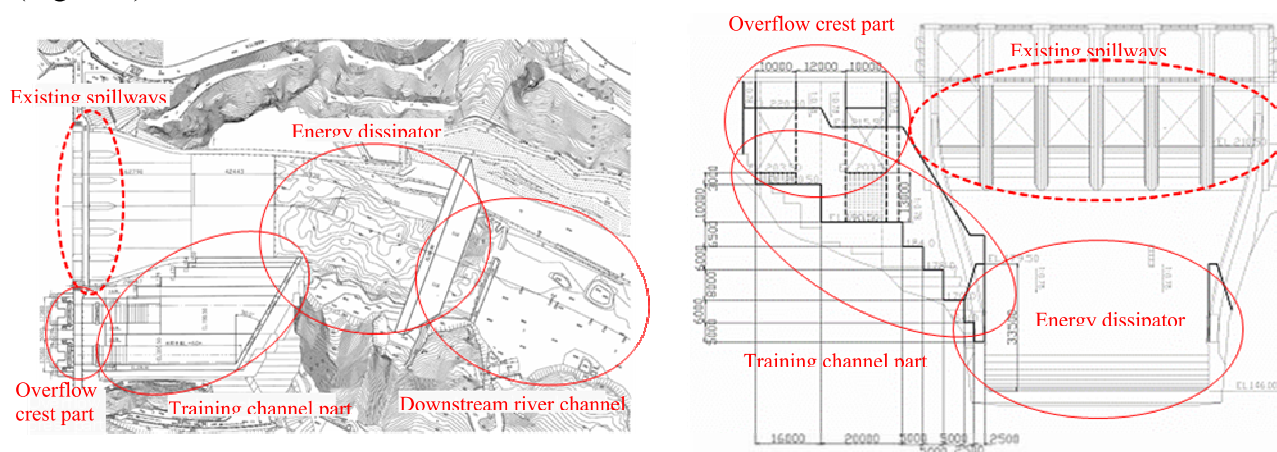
Plan view (left) and downstream view (right) of the original design shape
